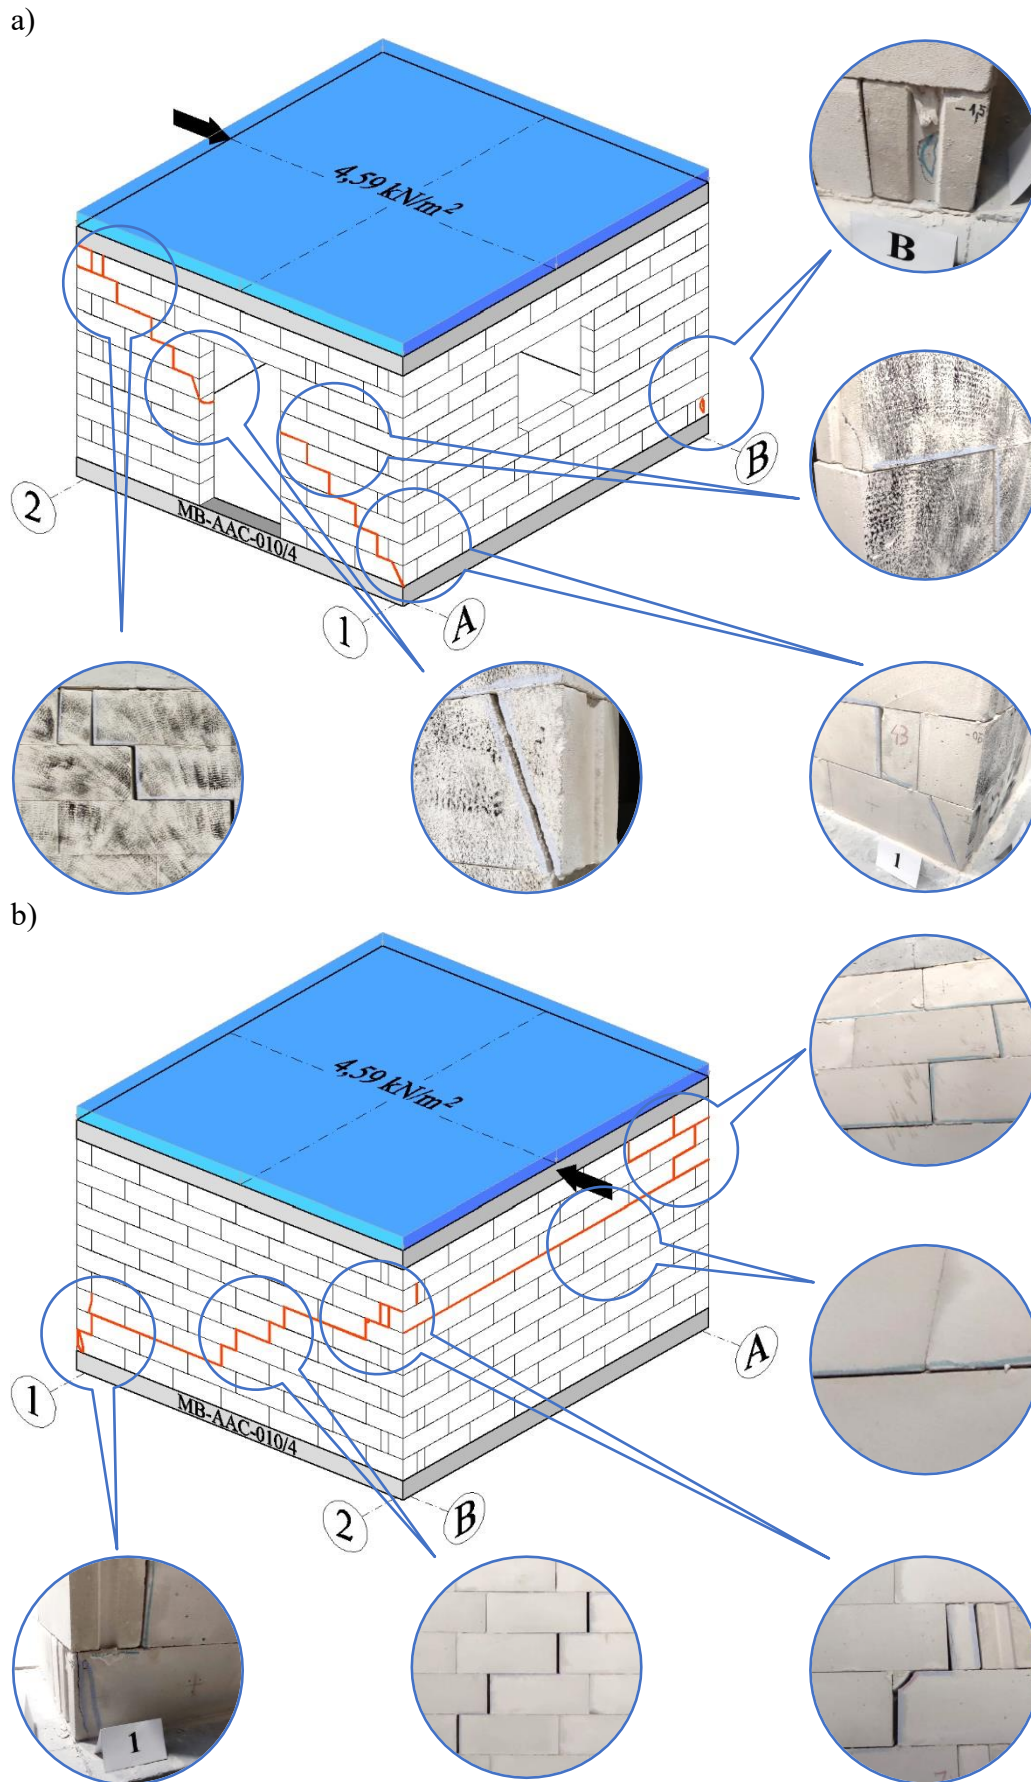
Crack pattern – model MB-AAC-010/4: a) view of the stiffening wall A with the door opening, b) view of the stiffening wall B without an opening
